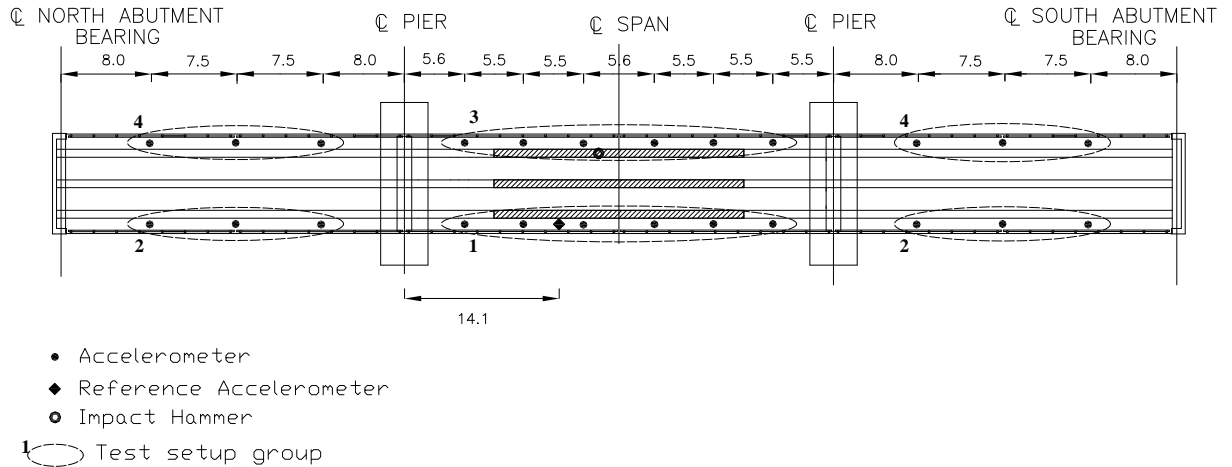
A plan view showing test setup for impact testing at Hudson Bay Bridge.
